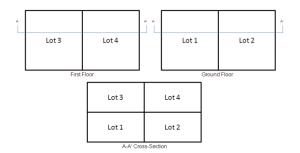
A subdivision plan that is extracted from the structure of a building (physical information).
